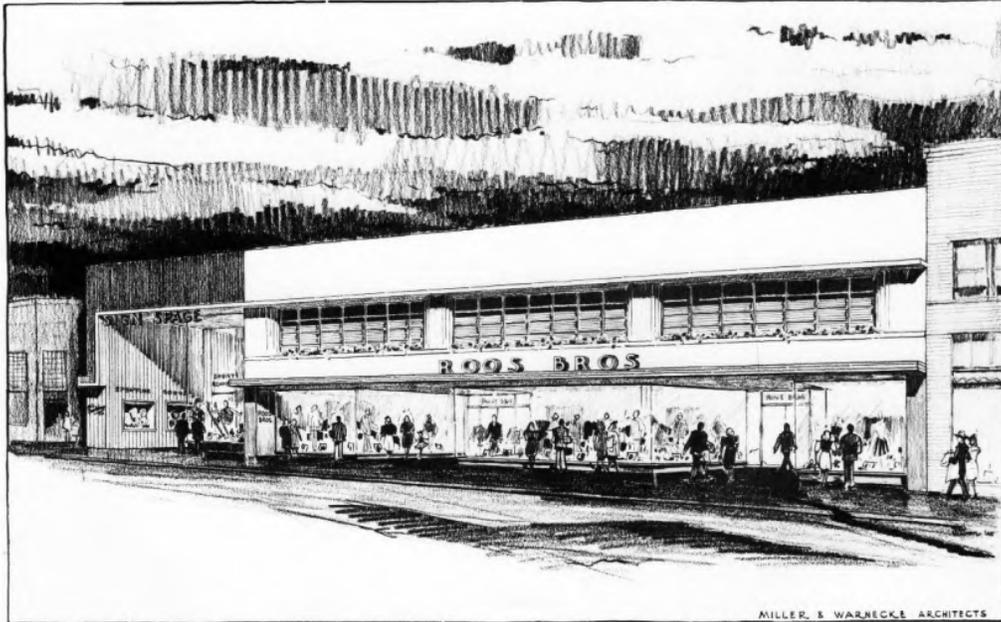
Undated sketch of Roos Bros. building, collection of the Warnecke Architectural Archive.
